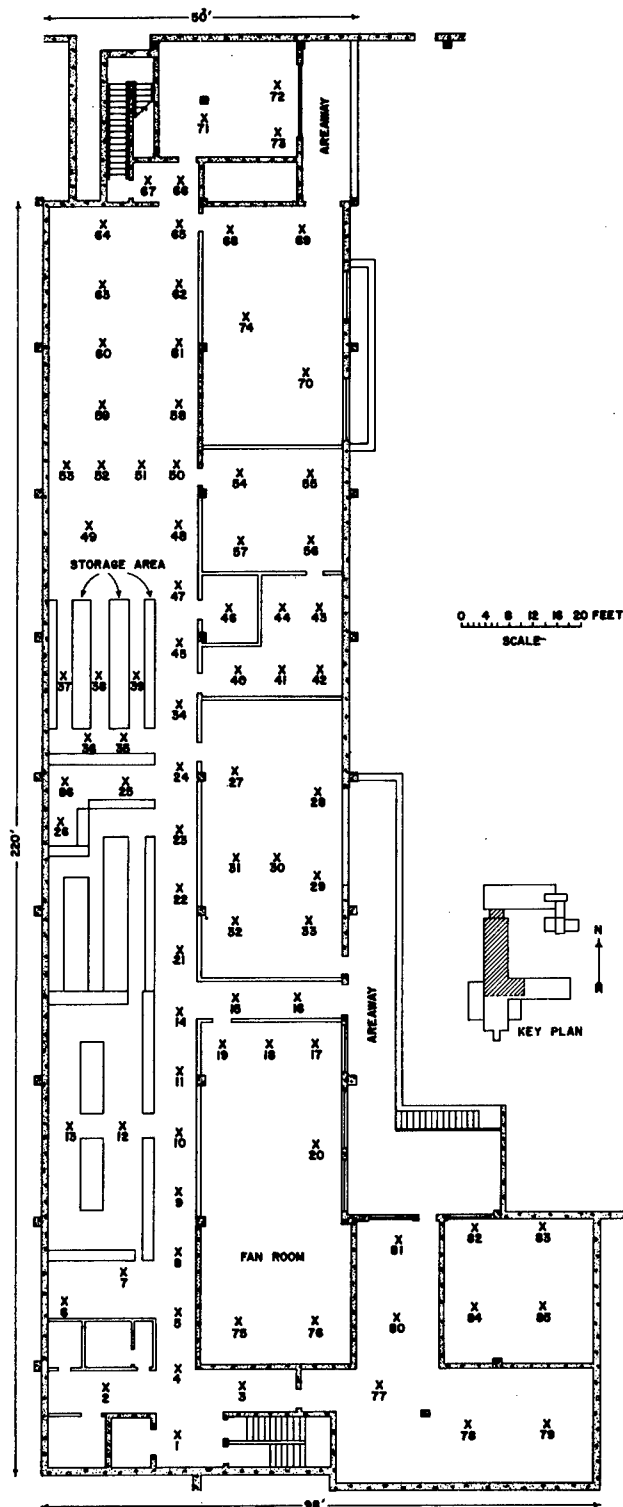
Floor plan of basement of UCLA structure with detector positions indicated.
